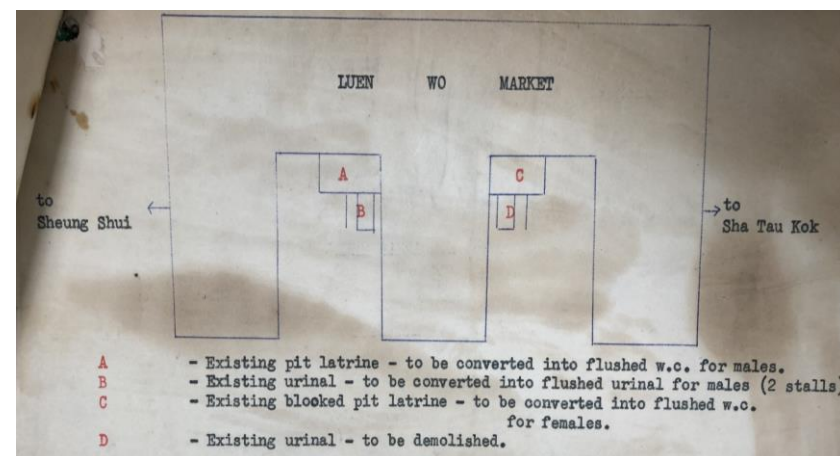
Improvement plan of the latrines at Luen Wo Market, 1961.<sup>238</sup>
